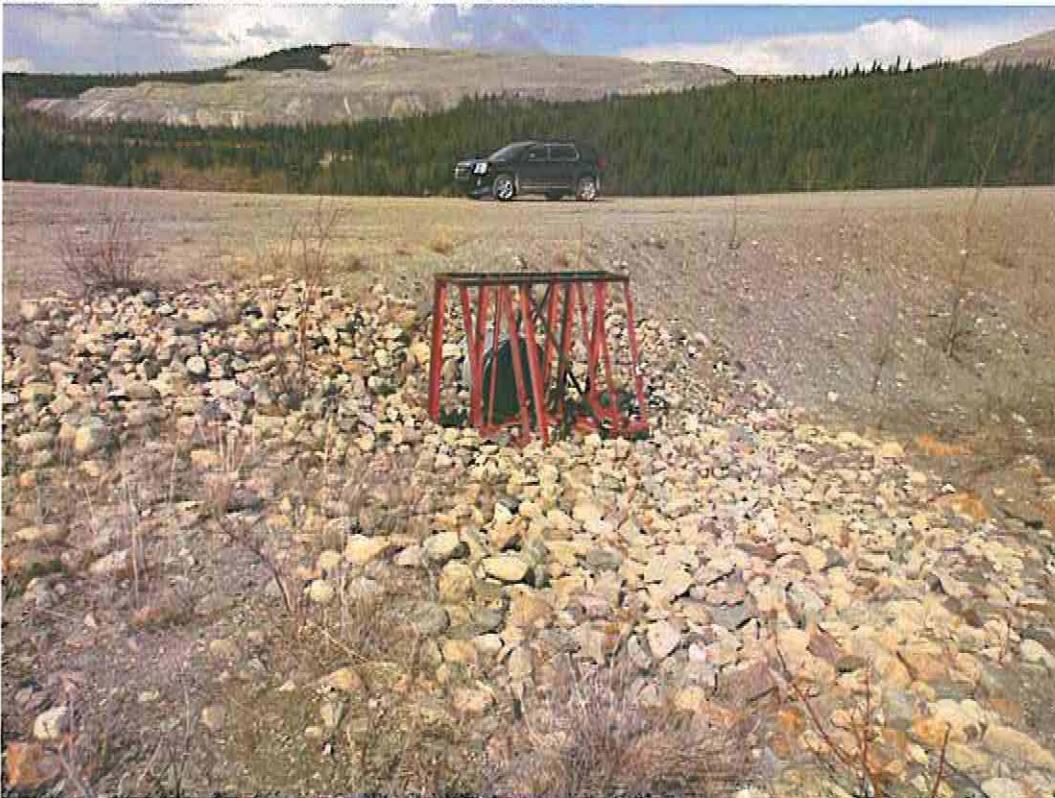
Inlet to the Emergency Spillway at Little Creek Pond
